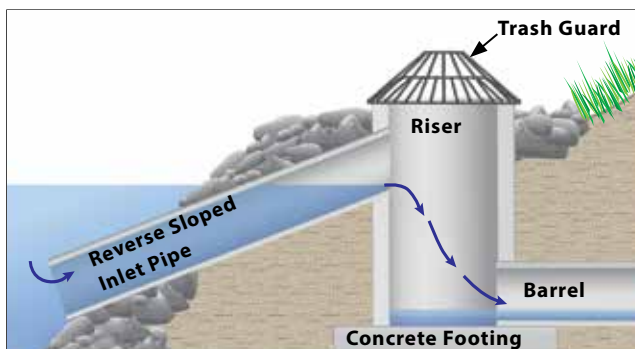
Reversed Slope Inlet Pipe to Drop Structure
